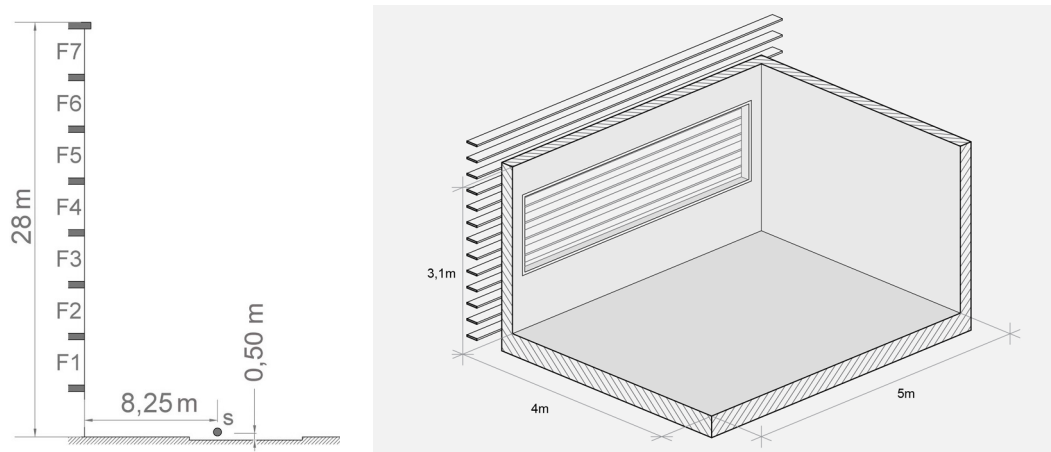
LEFT: Section of the building façade. Dimensions are in meters (m). Each floor is 3.50 m high, including the thickness of the floor slab. The sound source S is placed at 8.25 meters from the building façade and 0.50 m from the ground, simulating the sound emission of a traffic lane. F1-7 indicates the floor level.
